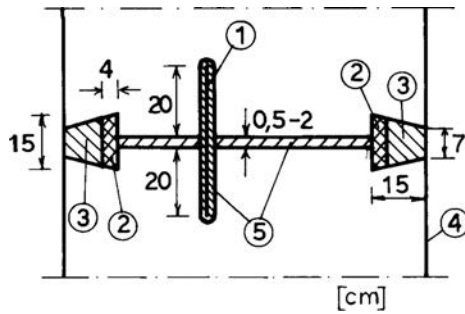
Example of filling of vertical deformation joint of concrete diaphragm wall. (1) Steel sheet, 2–4 mm thick; (2) resin infilling; (3) concrete plug; (4) downstream face of diaphragm wall; (5) asphalt mastic infilling.
